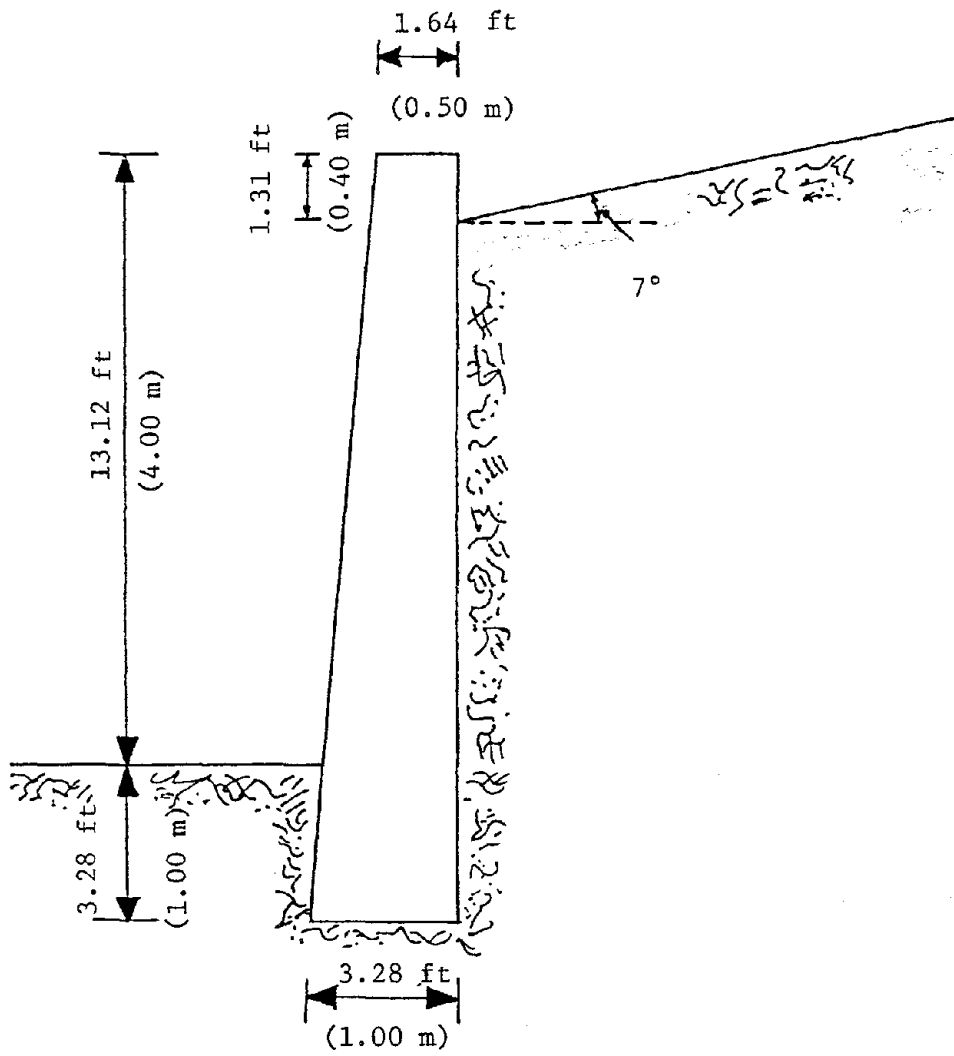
CROSS-SECTION OF WINGWALL AT LOCATION C-C
